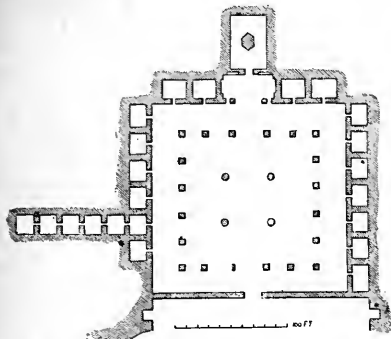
Cave at Baugh, on the Nerbudda; plan.
